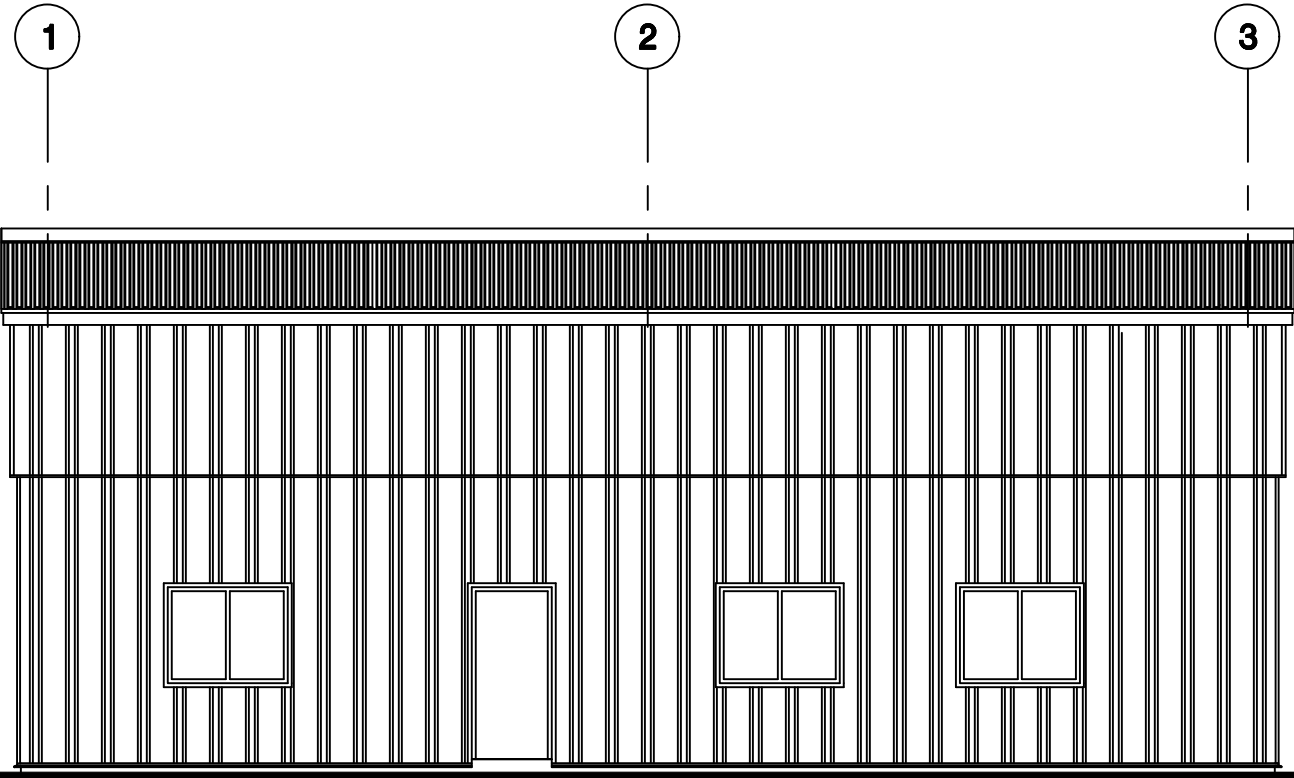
Exhibit A – Kauai Fire Department Helicopter Preliminary Plans
